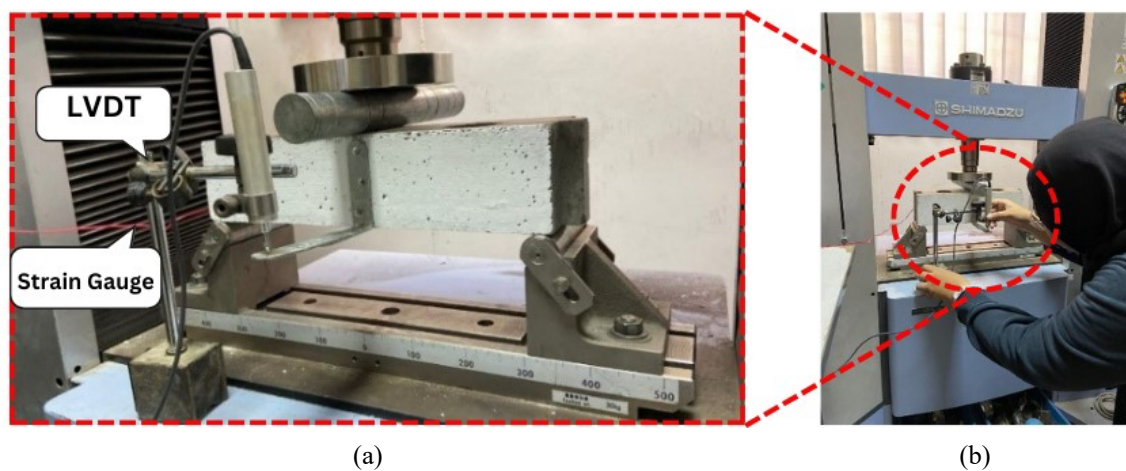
The Installation of Strain Gauge and LVDT with the Universal Testing Machine (UTM): (a) the enlargement; (b) test set-up
